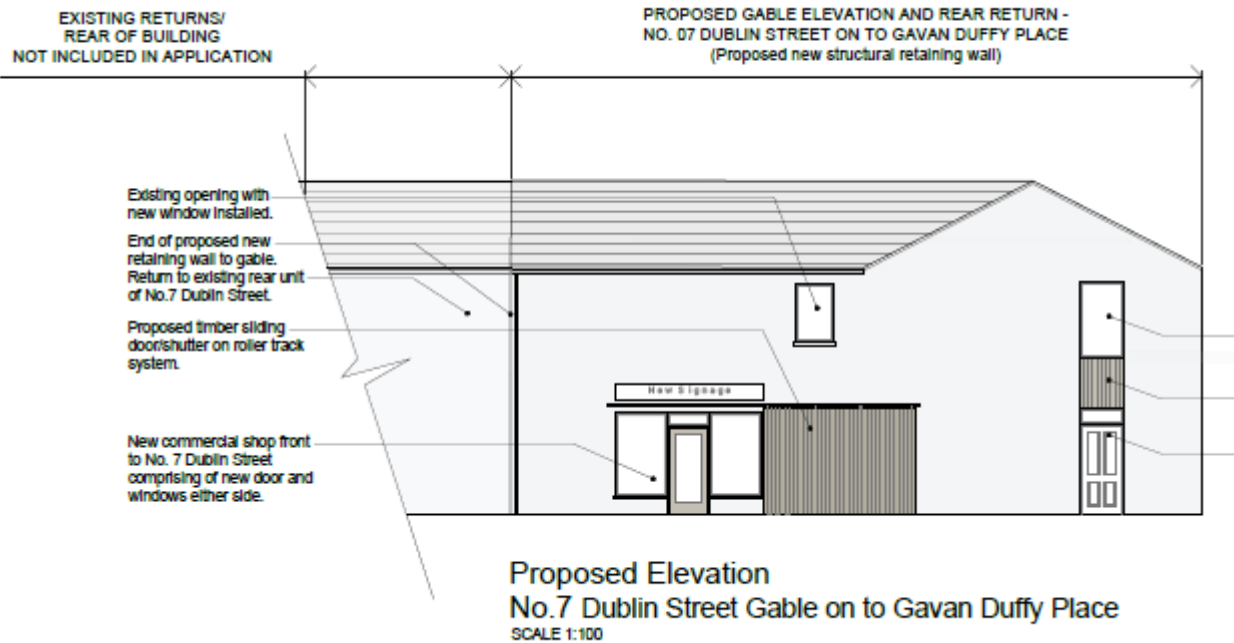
Excerpt from Planning Drawing A-20-002 showing the proposed elevation on the new gable of No 7 Dublin Street (Monaghan Boot Co)
